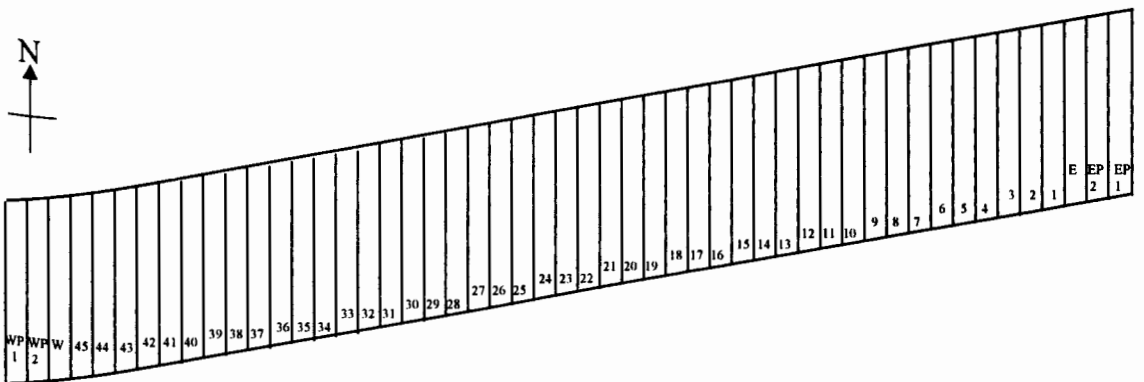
Layout of Botley Flyover centre span beams before demolition
